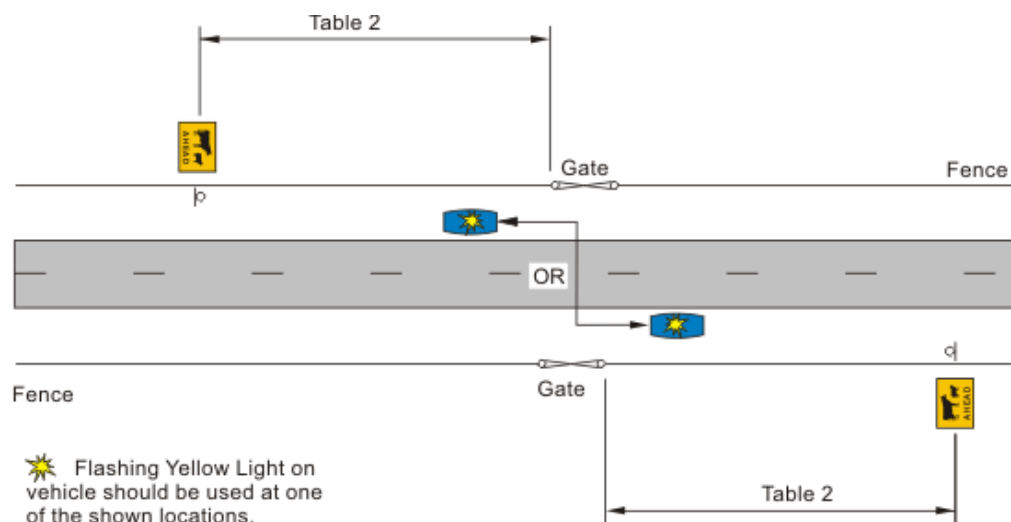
Typical Stock Crossing Site – for bitumen roads/gravel roads.
